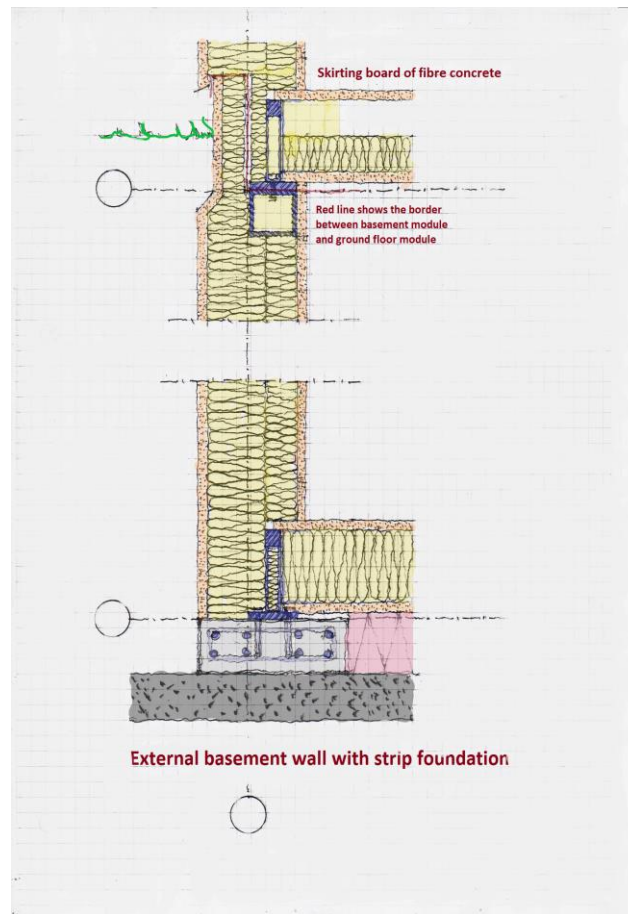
An ordinary carcass carrying a basement wall and foundation (Barrett, 2016)
